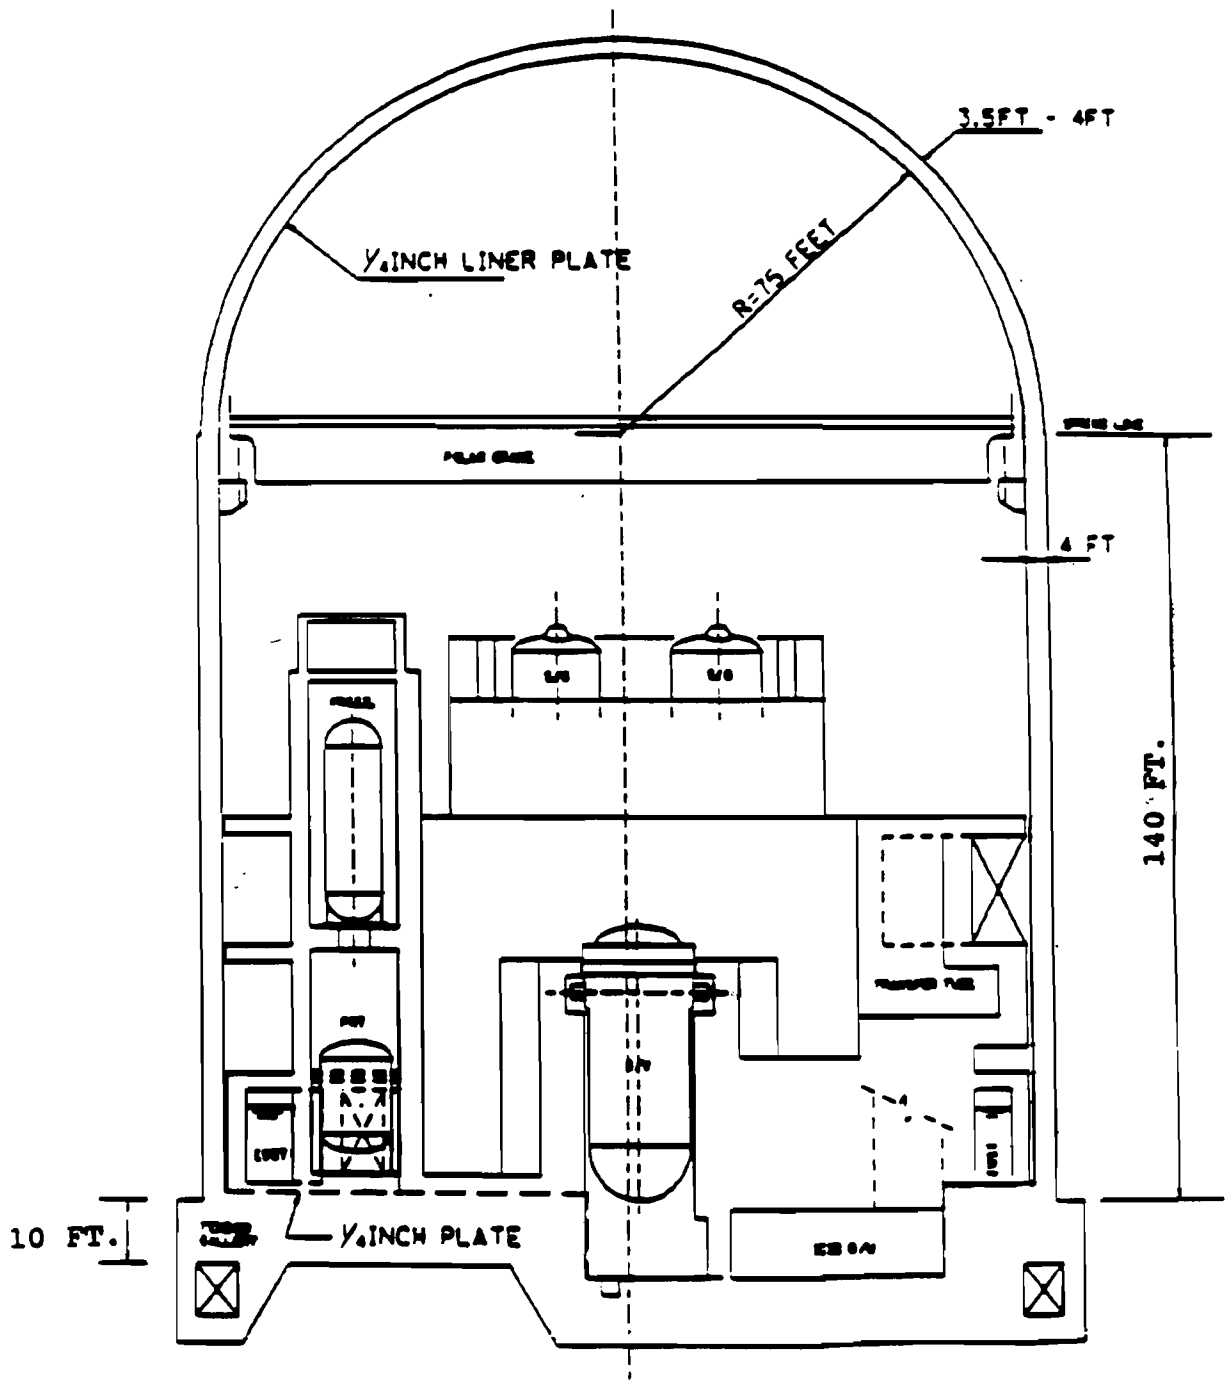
PRESTRESSED CONCRETE CONTAINMENT VESSEL (PCCV)
